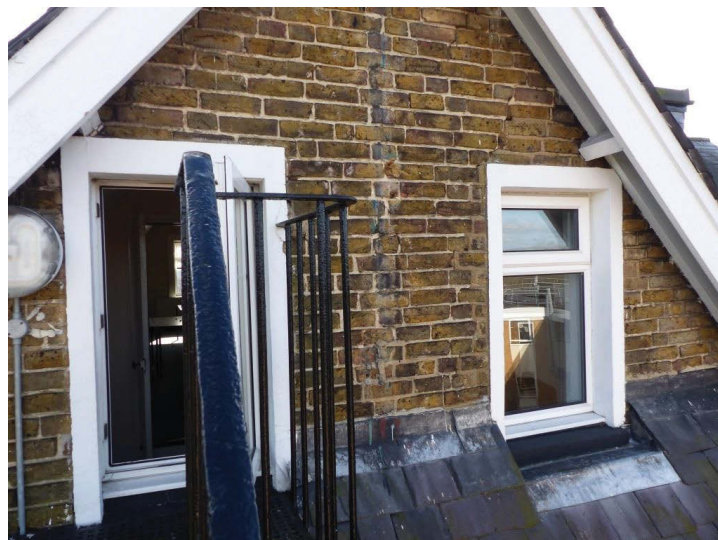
The two windows in the Phase 1 gable, north façade, looking south-west
